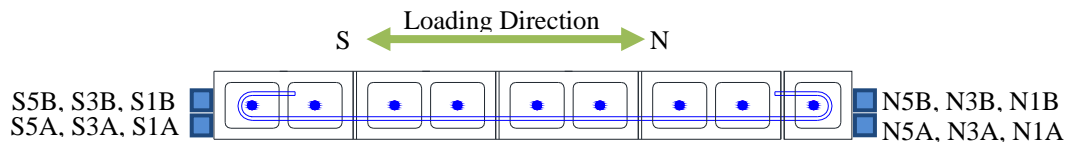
Cross section of the masonry wall showing the location of the linear potentiometer at north and south extreme.
